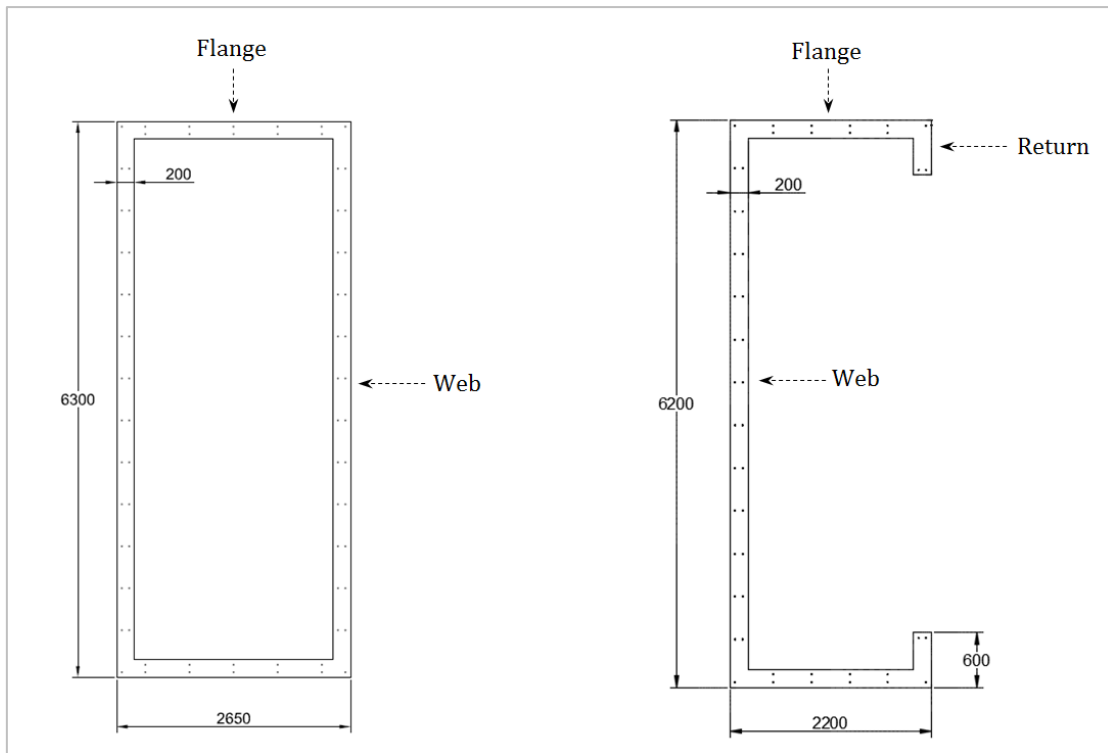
Box-shaped and C-shaped core wall detailing for a 5-storey building
